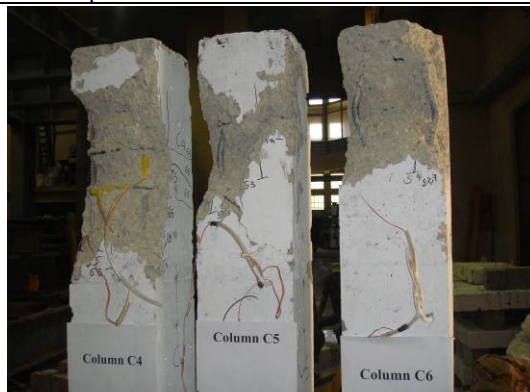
crack pattern and the shape of failure of c4 , c5 , c6
